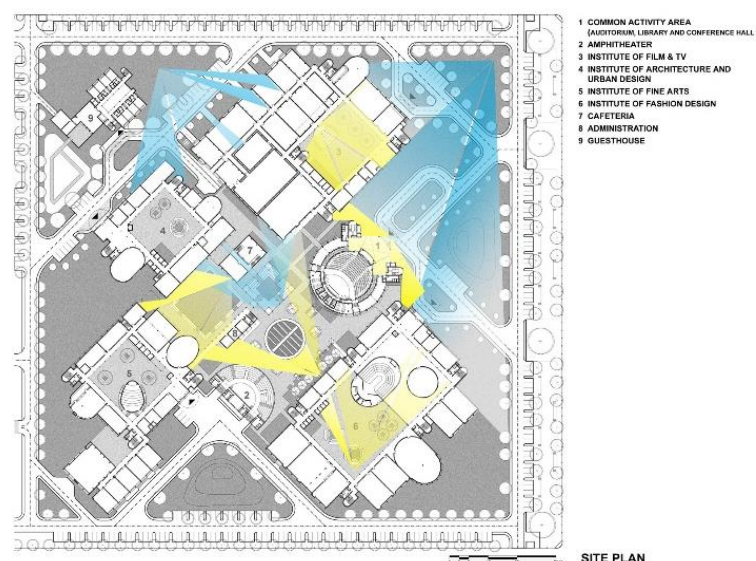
SUPVA Campus - Floor Plan Showing the Isovist View
